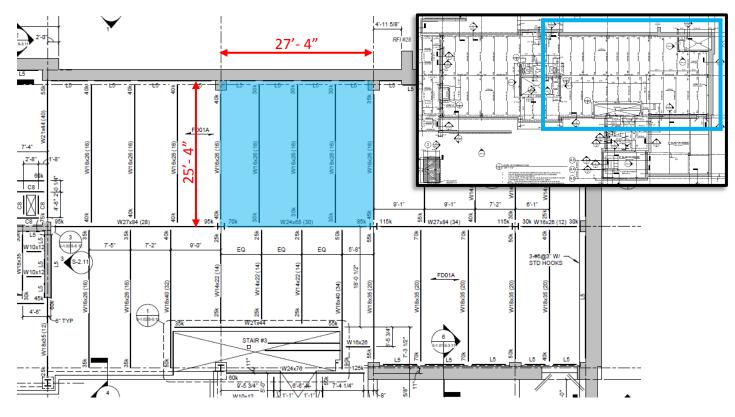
Level 2 Framing Plan Showing Typical Bay (Sheet S-1.02)
